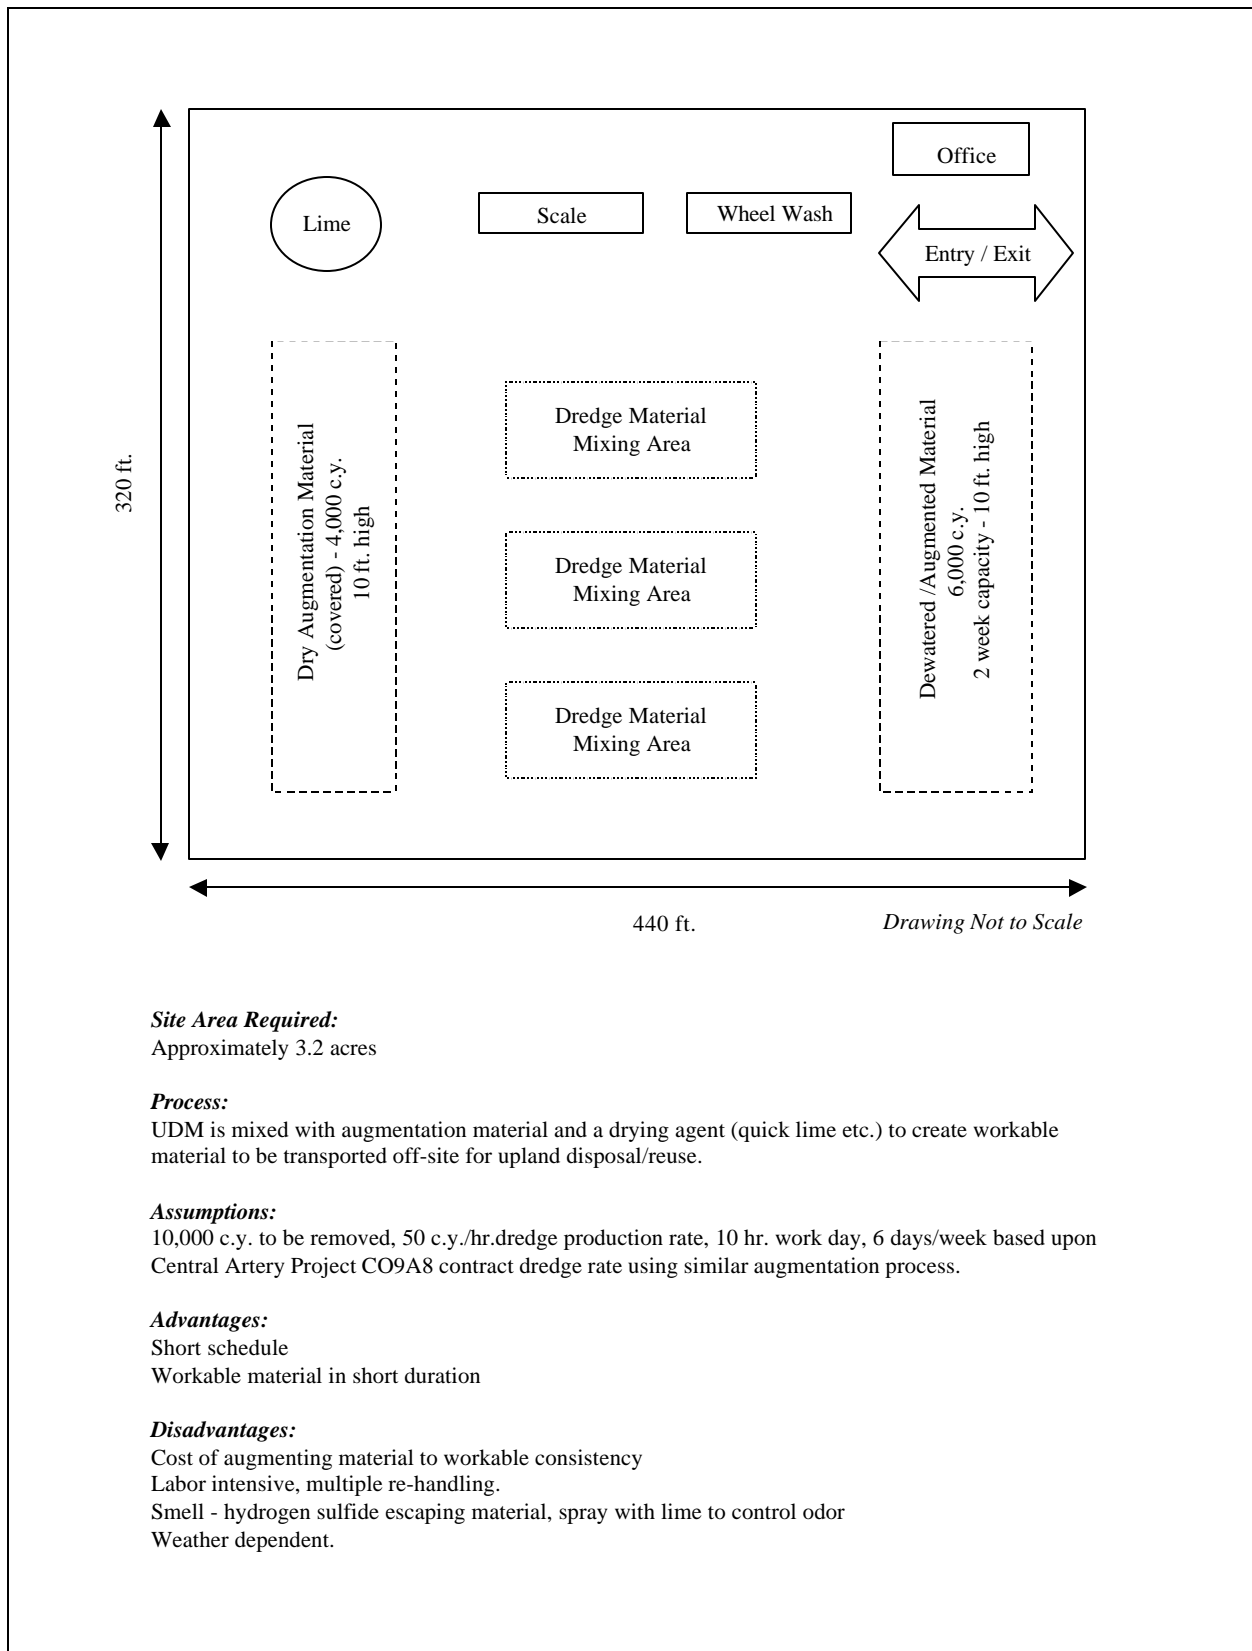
DMMP Dewatering Site Conceptual Layout
